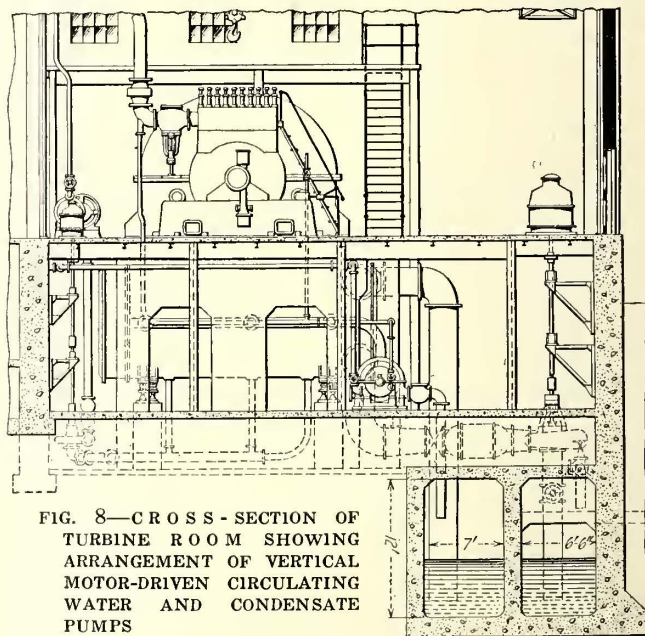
CROSS-SECTION OF TURBINE ROOM SHOWING ARRANGEMENT OF VERTICAL MOTOR-DRIVEN CIRCULATING WATER AND CONDENSATE PUMPS
